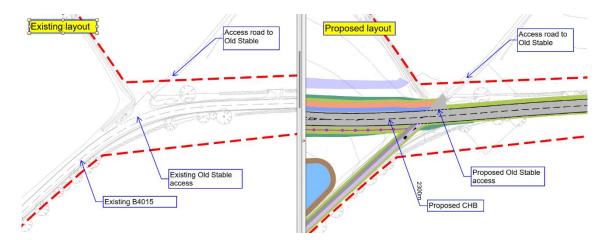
Existing and proposed layout at the Old Stable access to B4015
